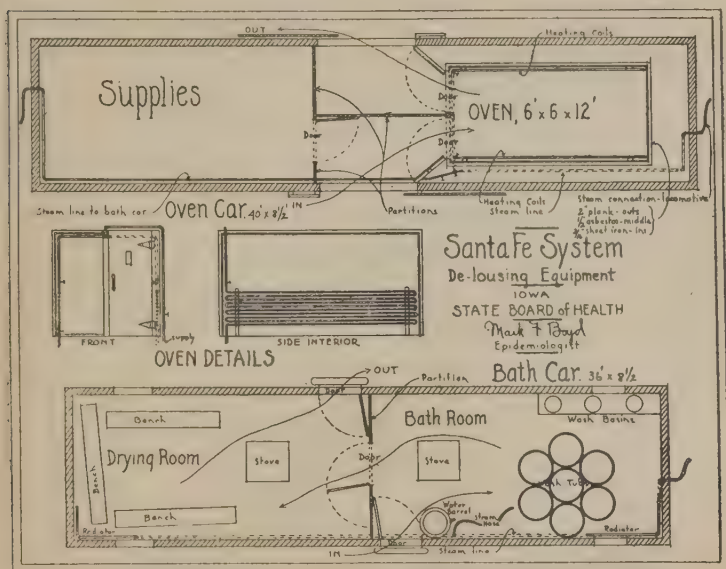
Arrangement of Oven Car for sterilization of clothing and bedding, and of Bath Car as bath room and drying room, Santa Fé Railway, U.S.A.
